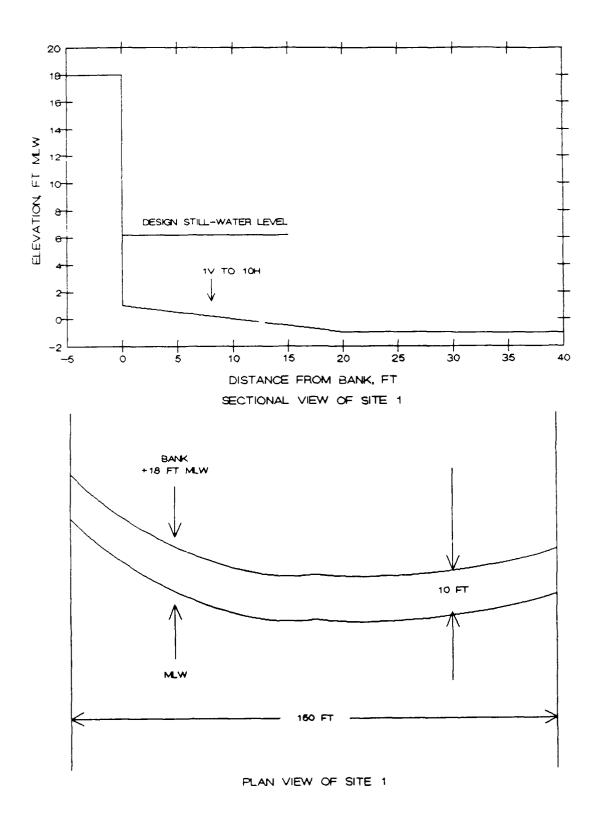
SECTIONAL AND PLAN VIEWS OF SITE 1
